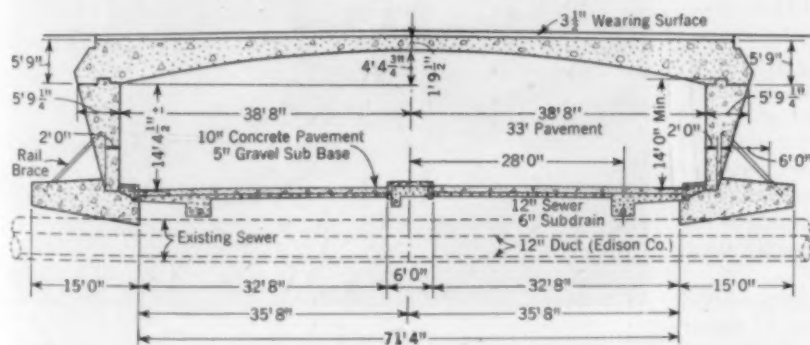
SECTION OF SECOND AVENUE BRIDGE, A TYPICAL SINGLE-SPAN CROSSING
